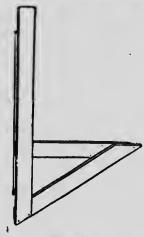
Showing "ditch guage" to be used in making proper slopes at sides of ditch. The guage is made of light strips of wood, about three inches wide and one inch thick. The upright strip is four feet long. The horizontal strip is eighteen inches long from the left side of the upright piece (as you face the figure) to the point of guage at the extreme right, and the top of the horizontal strip is one foot above the bottom point of the guage.
